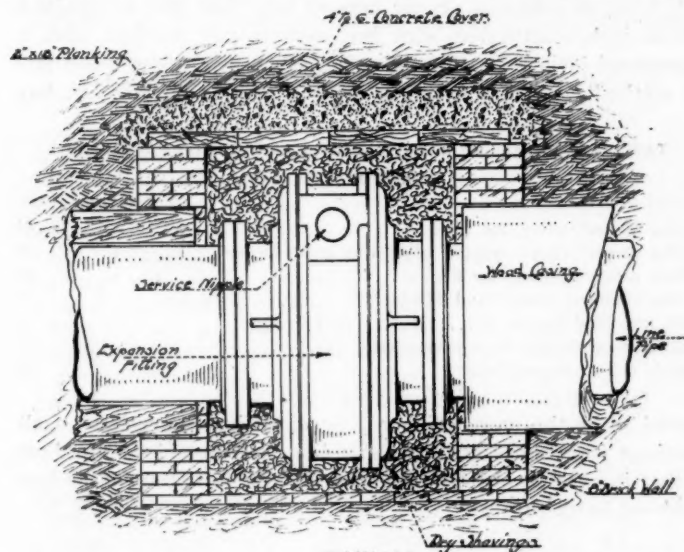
SECTION SHOWING METHOD OF INSULATING UNDERGROUND STEAM FITTINGS.
